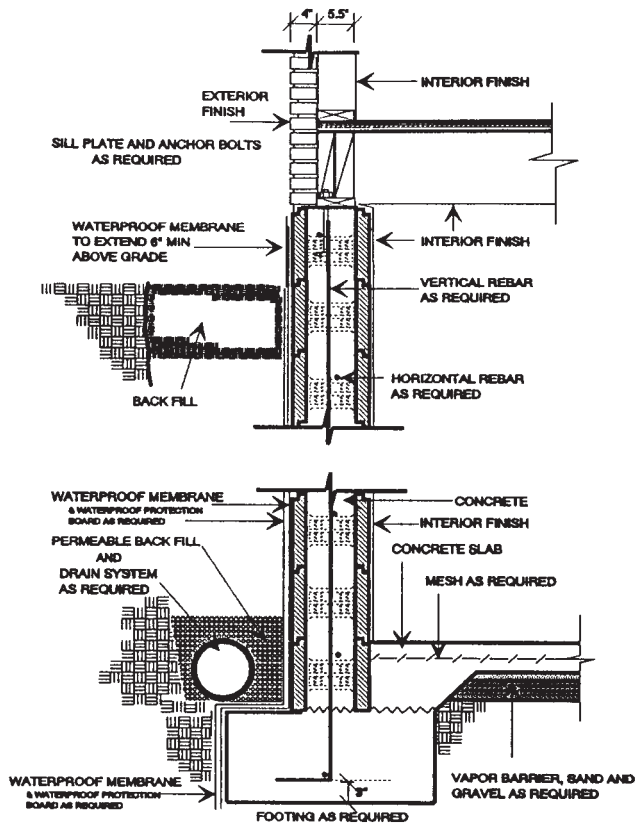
SF SERIES FOUNDATION WALL (STUD WALL CONSTRUCTION)
